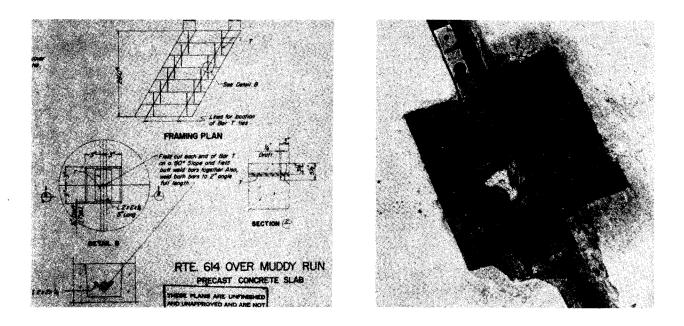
Connection detail requiring field weld and grouted keyway.
